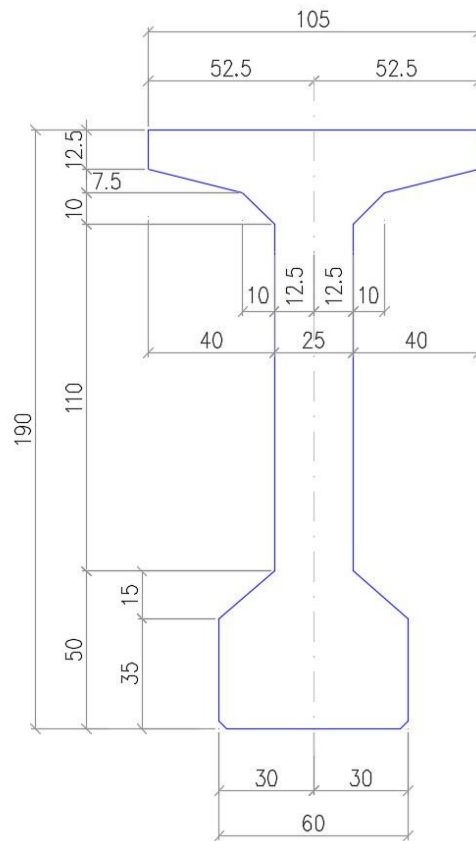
Cross-Sectional View and Dimensions of Precast I Girders
